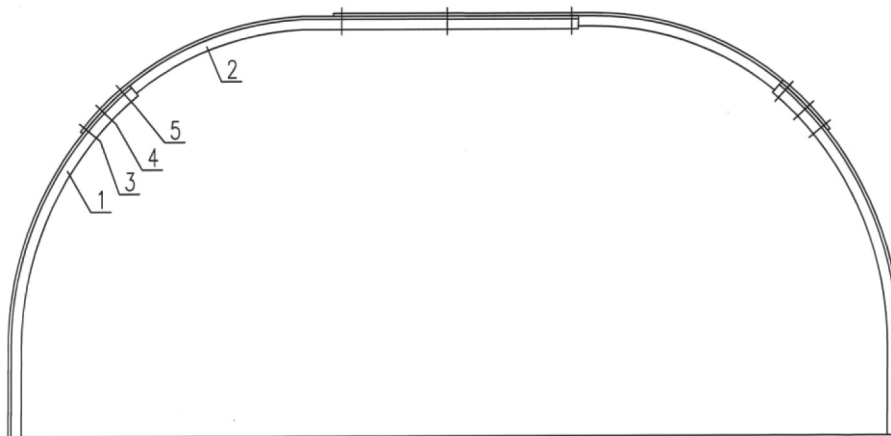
ŁPKOw frame: 1 – ŁP frame side section, 2 – ŁPP frame side section installed as the top section, 3–5 – shackles
